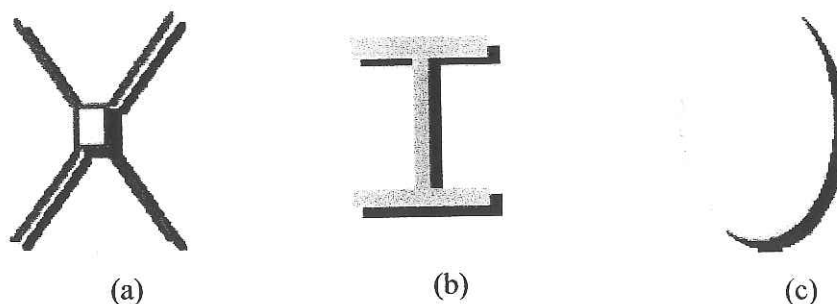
Cross Section of Pile : (a) X- shape, (b) H- shape and (c) steel pipe
